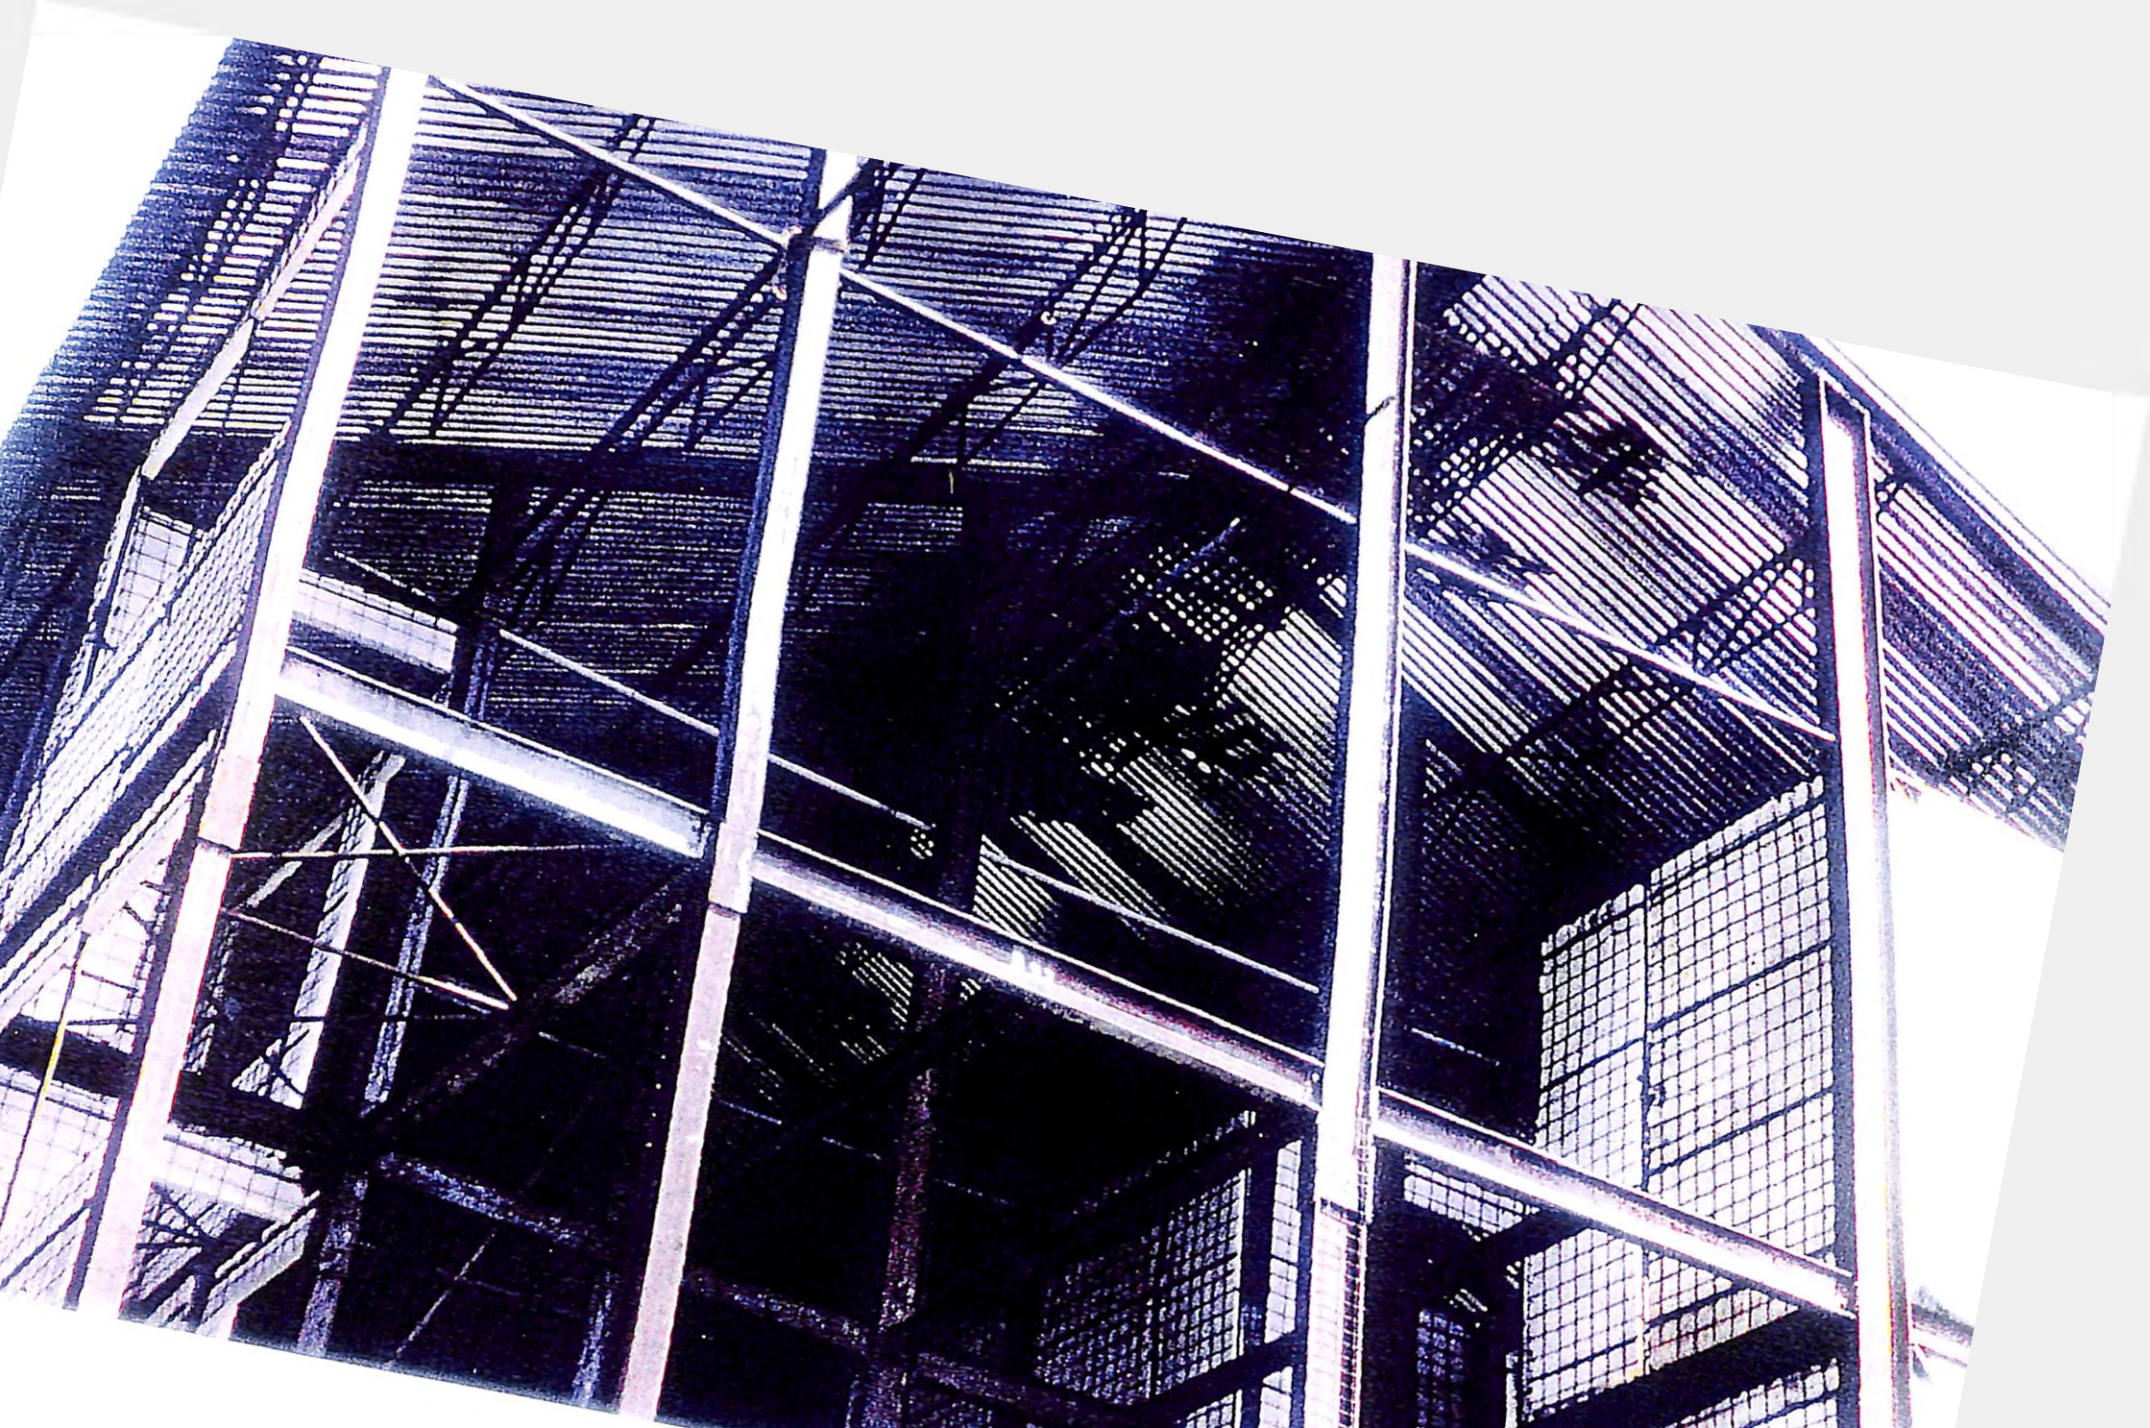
POSITIONING OF SANDWICH PANEL
